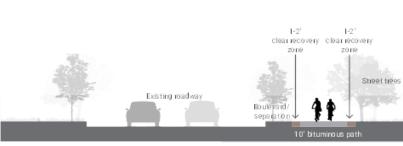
Fergus Falls GET: Adjacent to Roadway Typical Section
